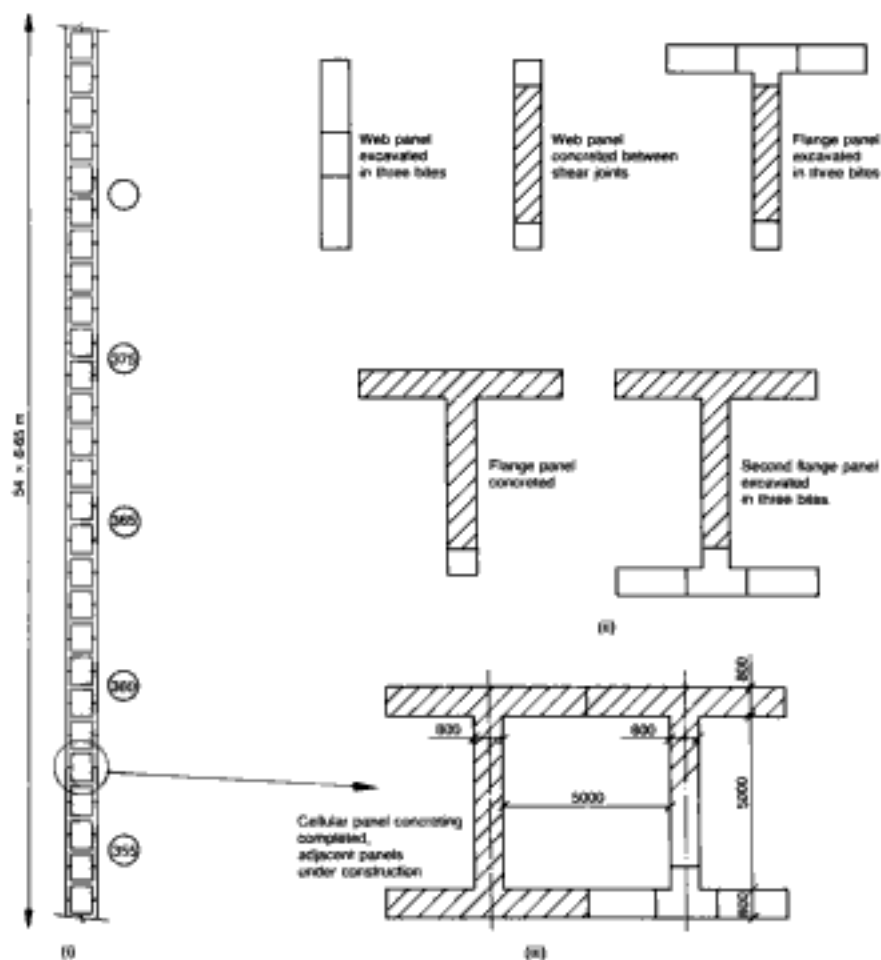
Development of continuity between diaphragm wall panels to achieve improved, structurally efficient wall plan forms (Puller and Puller²⁶)
